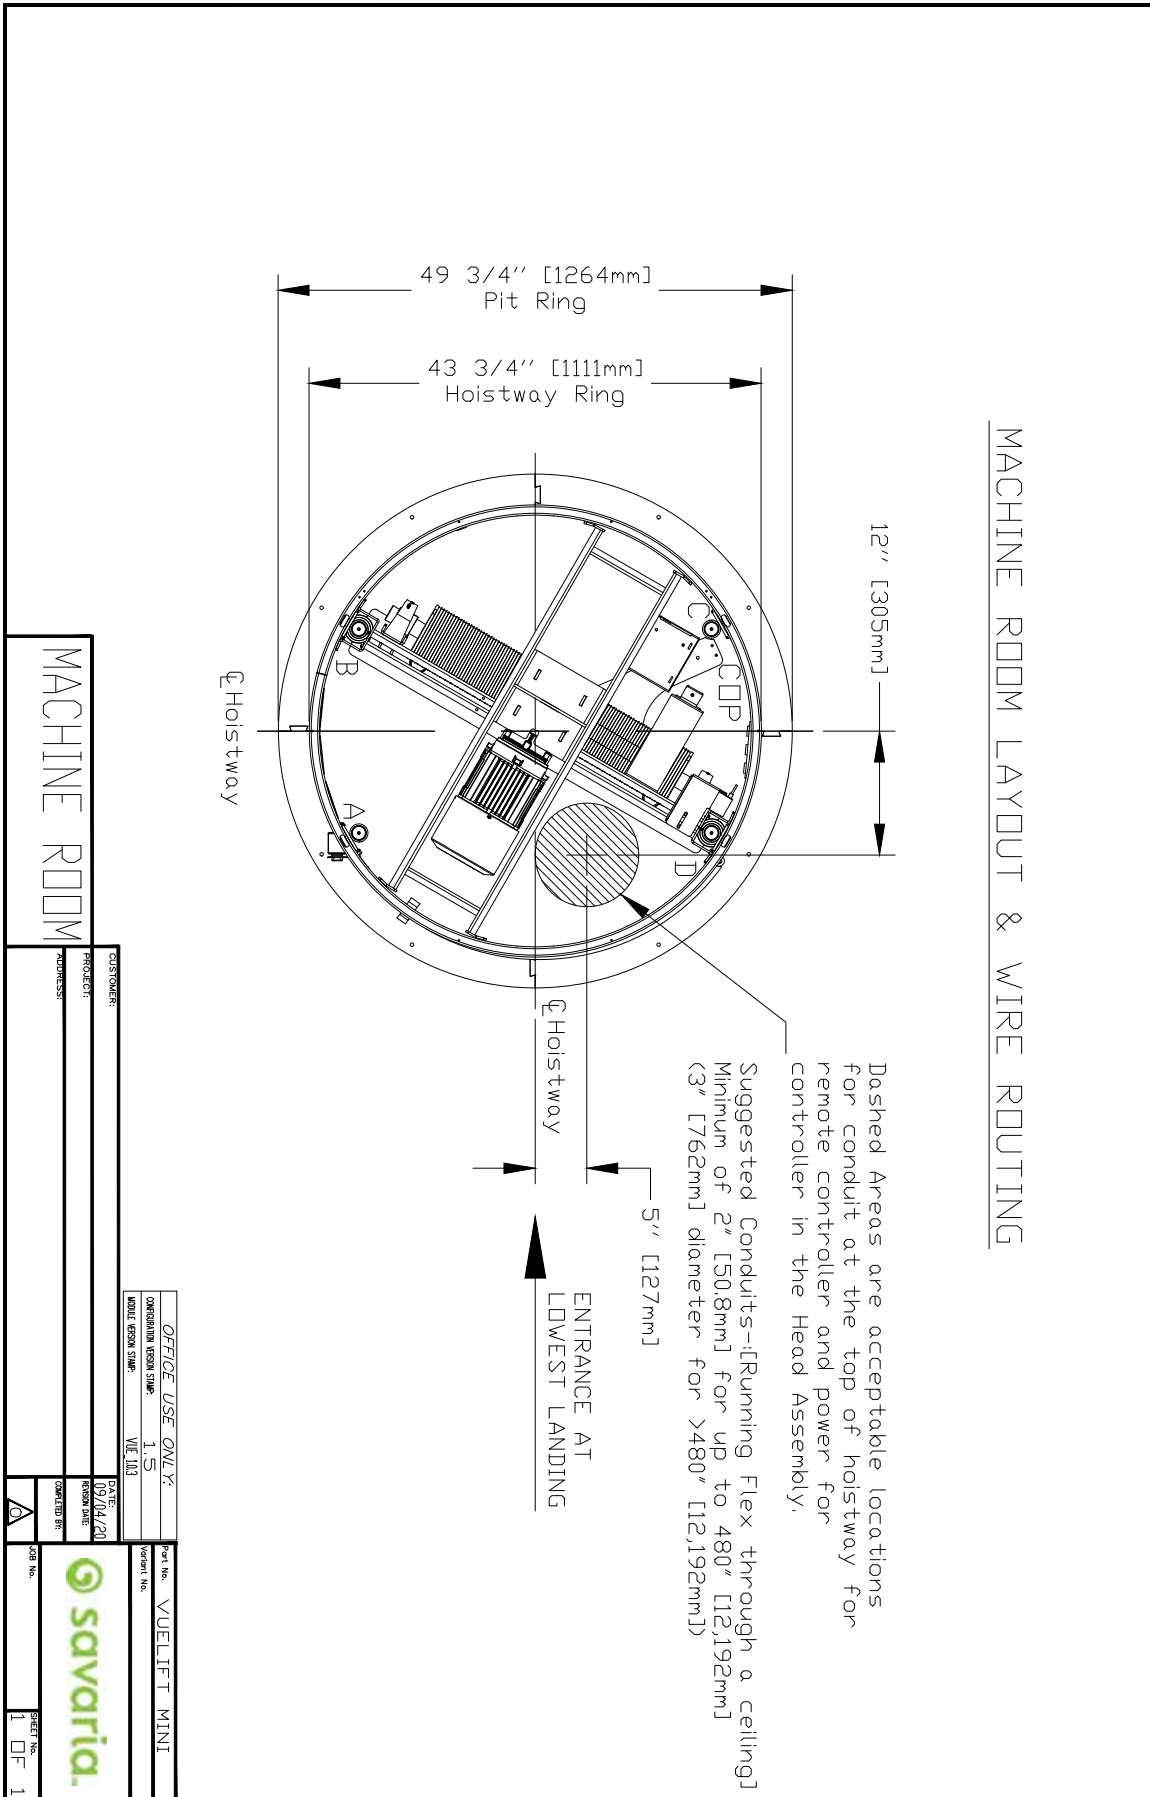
Wire routing from pit (acrylic/glass) - type 1 or 2
